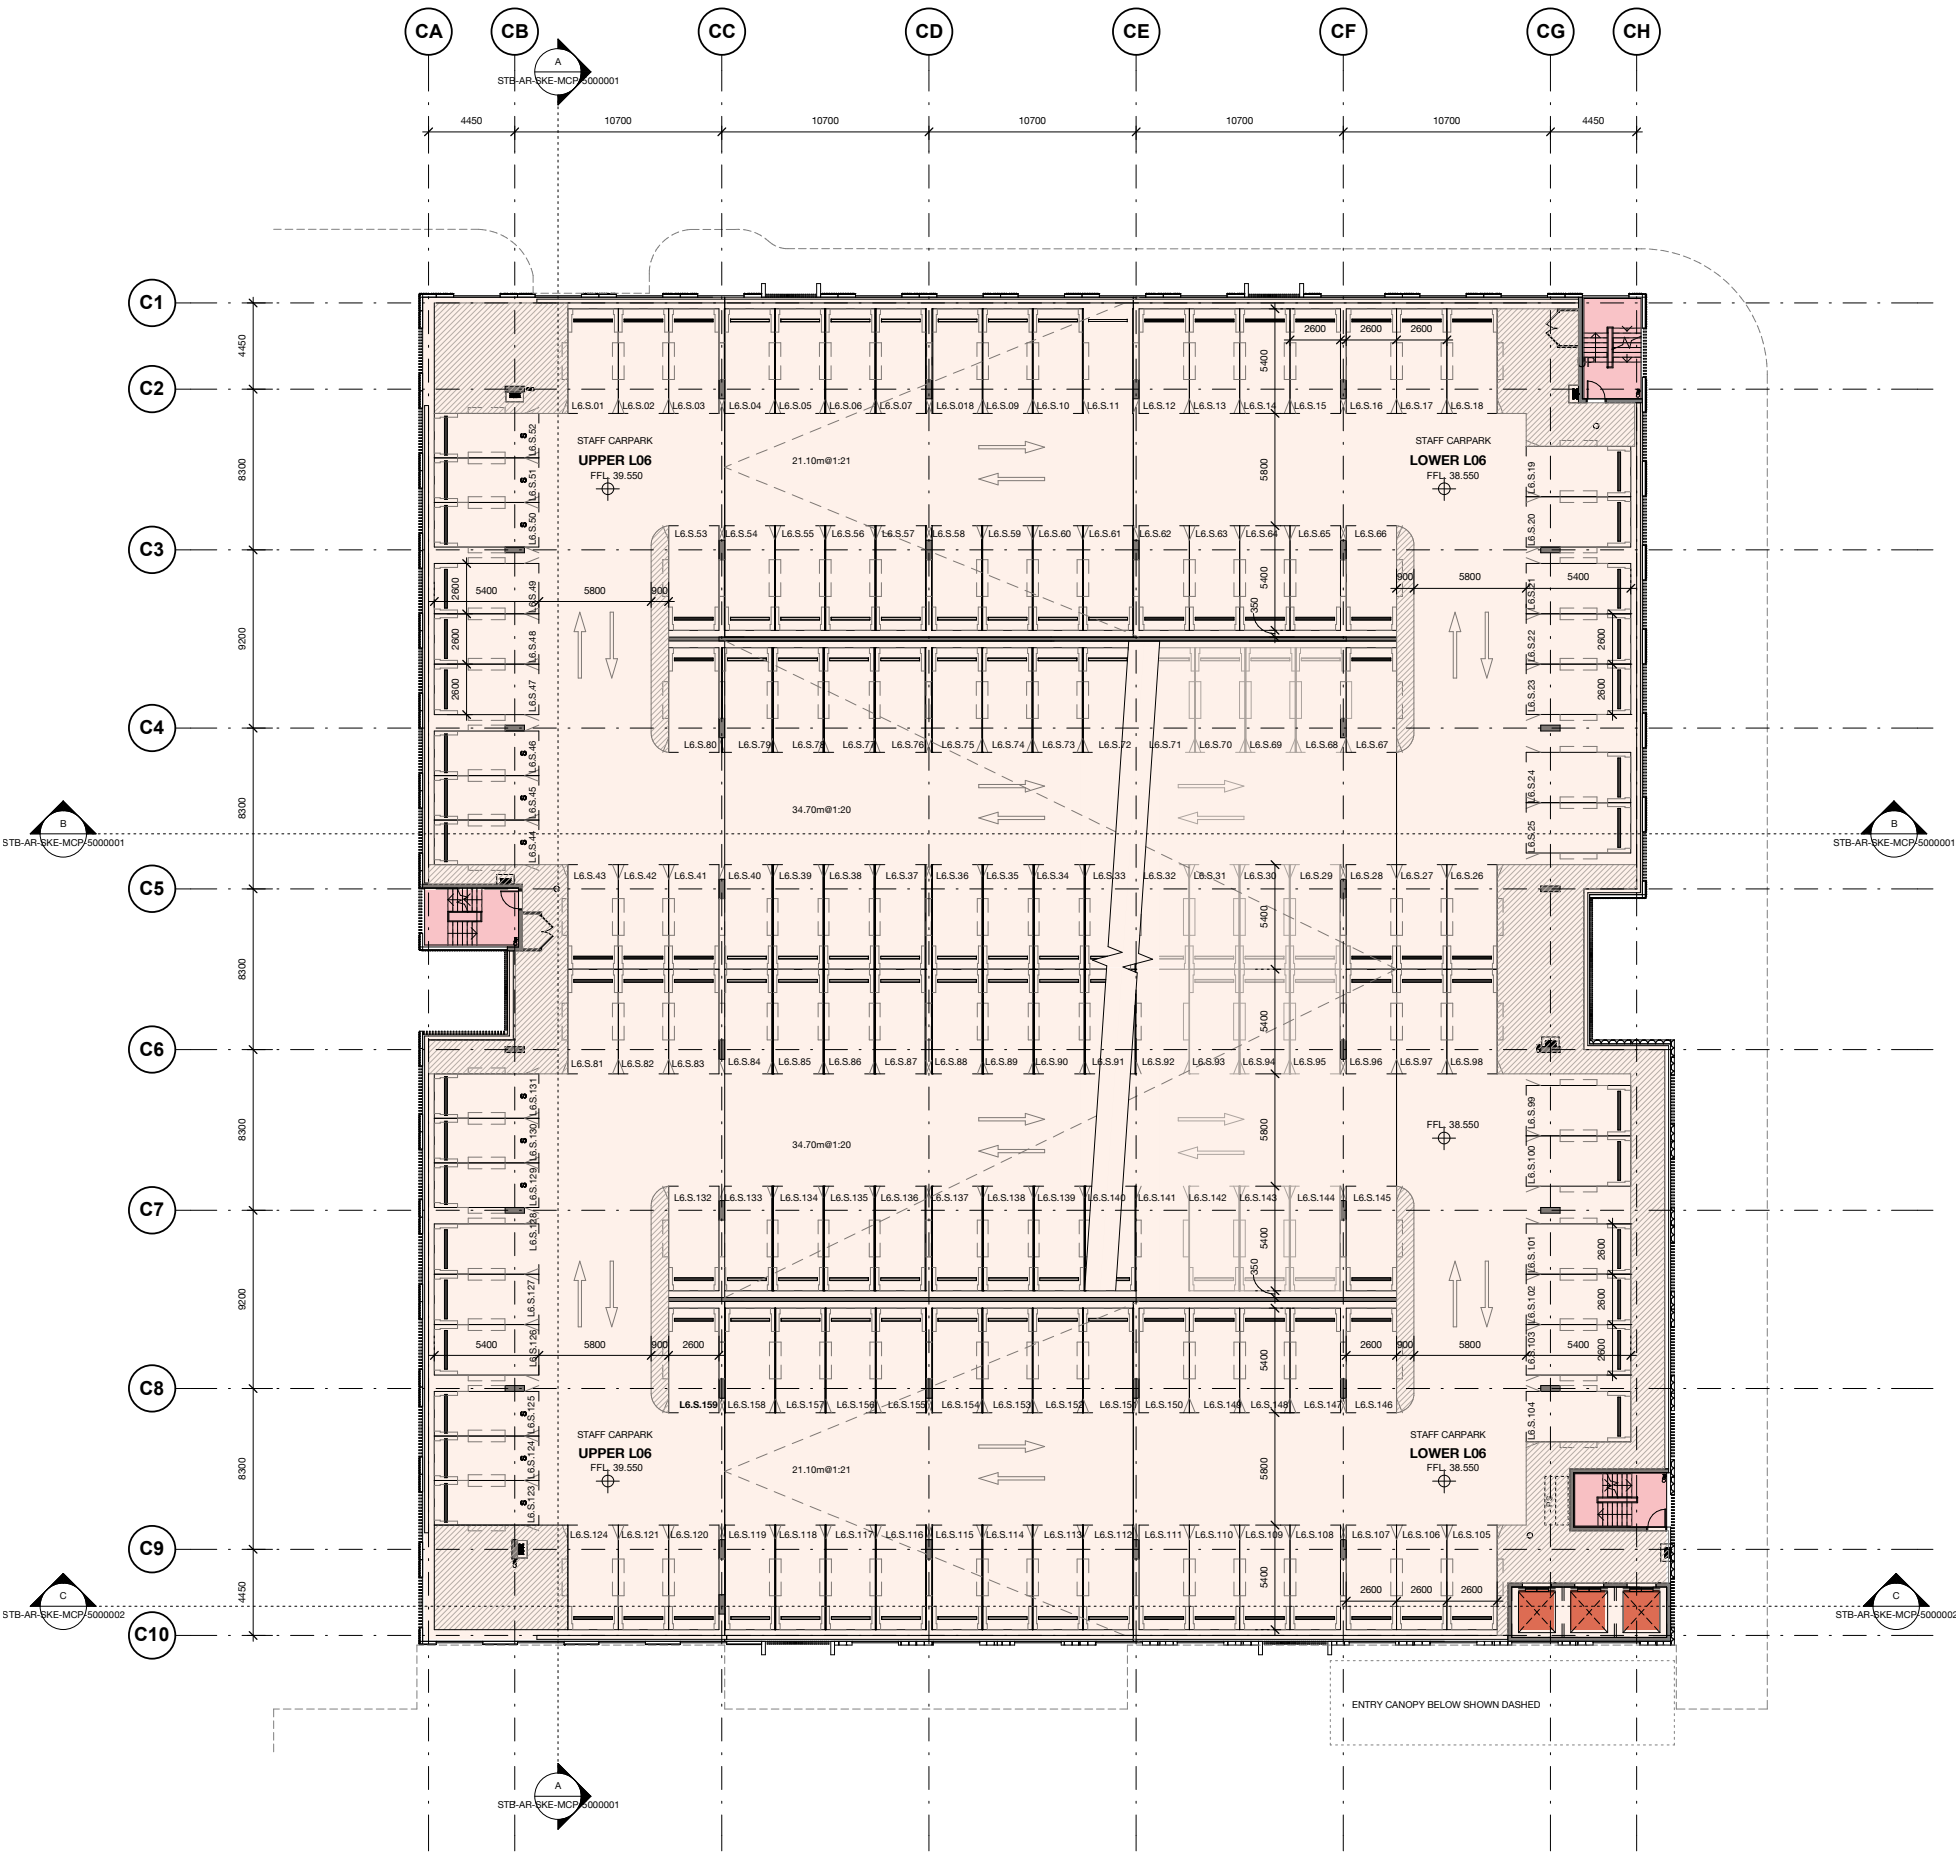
Multi-Deck Carpark, Floor Plan - Level 6
